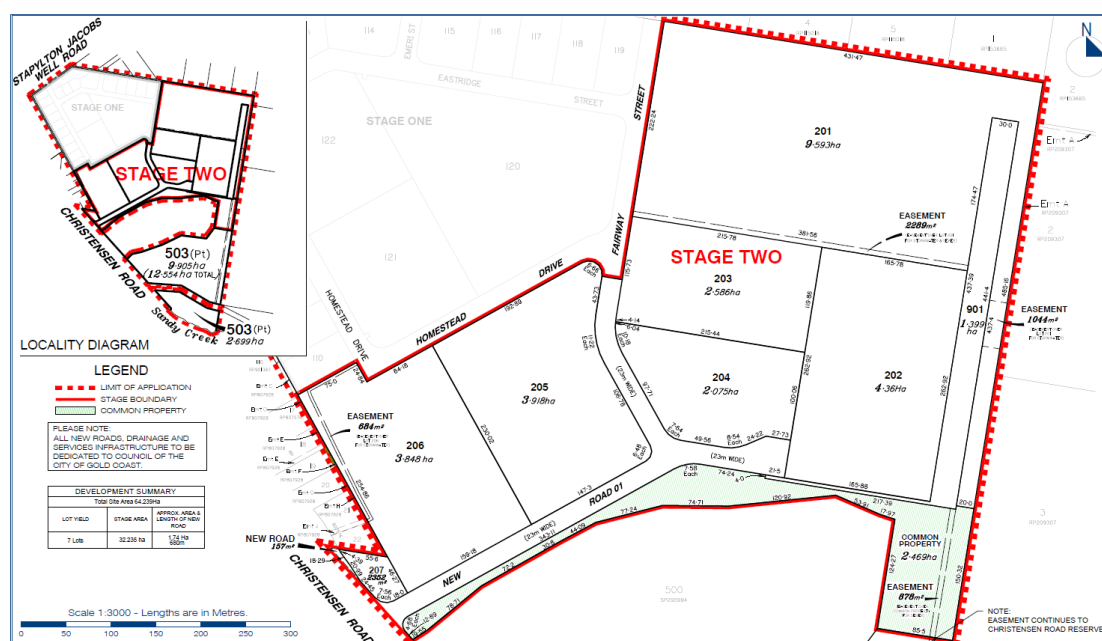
Proposed Plan of Development (GDP File, 2020)
